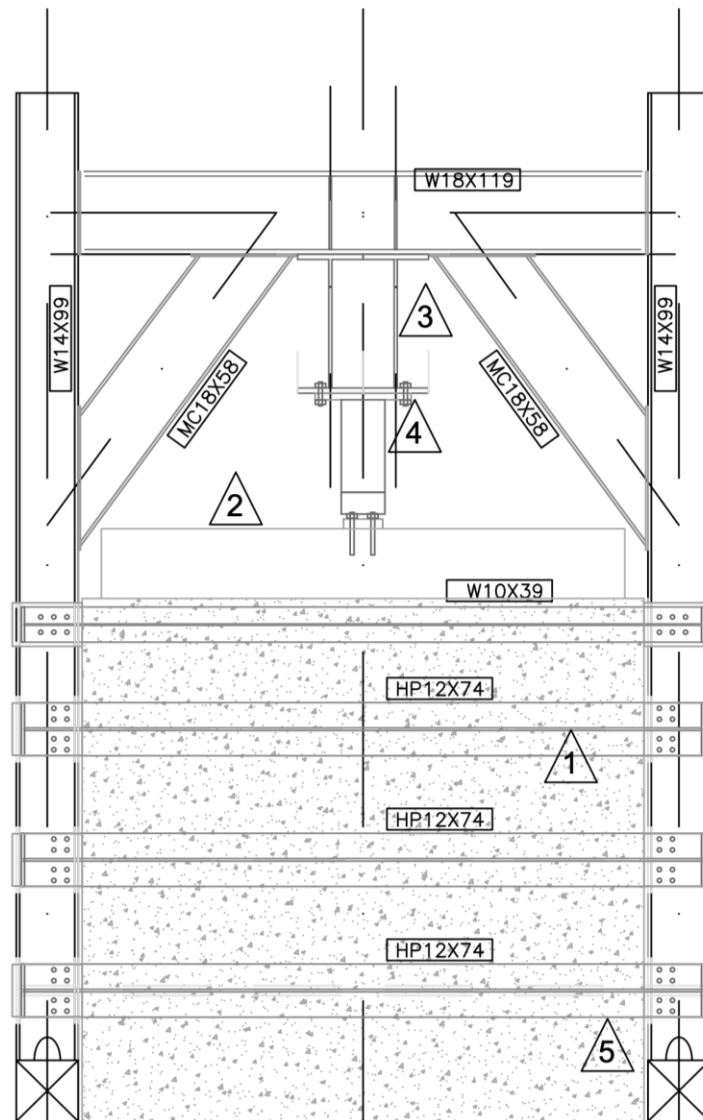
Steel reaction frame design – North elevation view (South similar)
